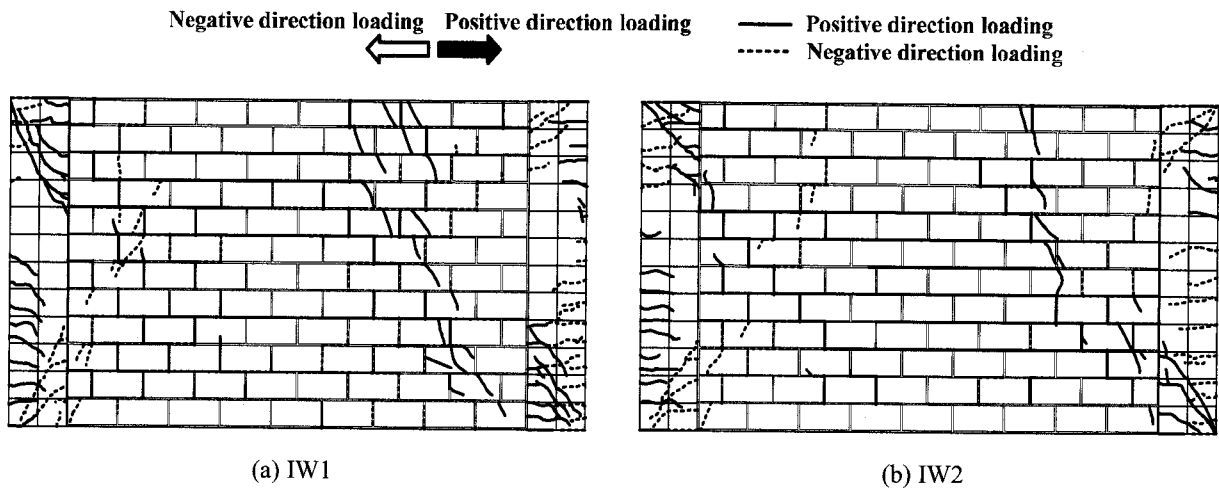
Cracks in RC columns and CB wall at the 1st cycle with peak drift angle of +1.0%
